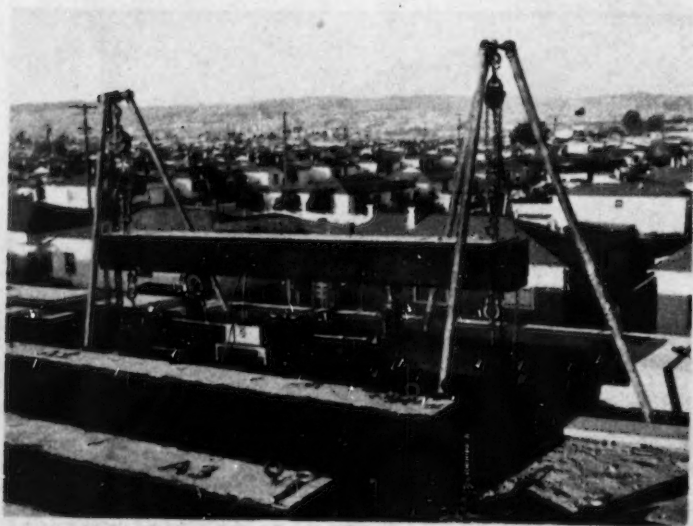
Determining Flexural Modulus of Elasticity of Concrete Beam.
